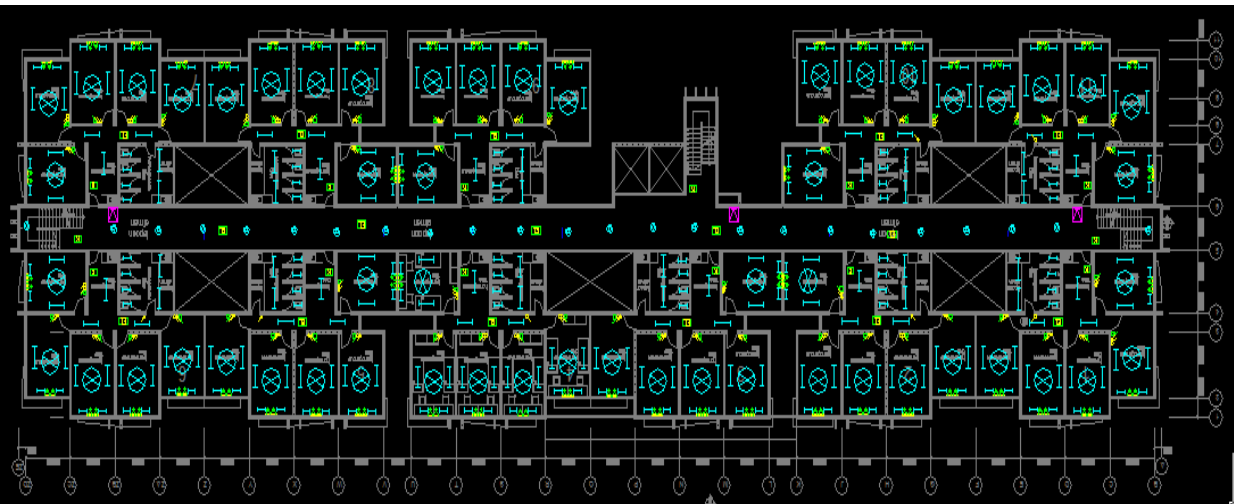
Design Layout for Ground Floor with Electrical Installation
